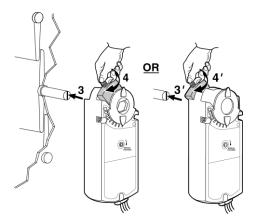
With the Damper Blades in the Desired "0" Position, Place the Actuator on the Shaft.
